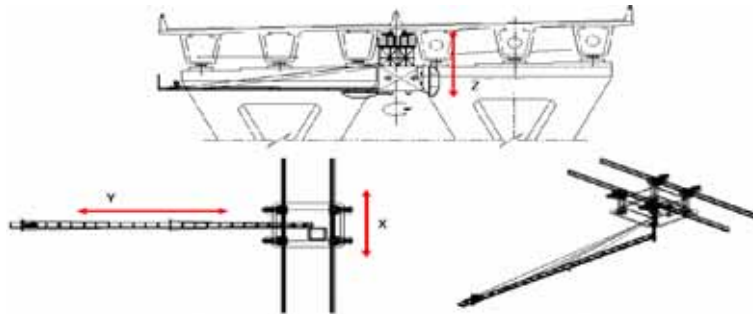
A Design Example of Bridge Appearance Inspection Mechanism
